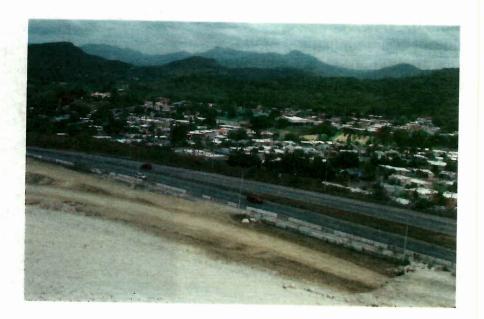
Lack of soil stabilization in slope (construction project area located east of Río Canas).
